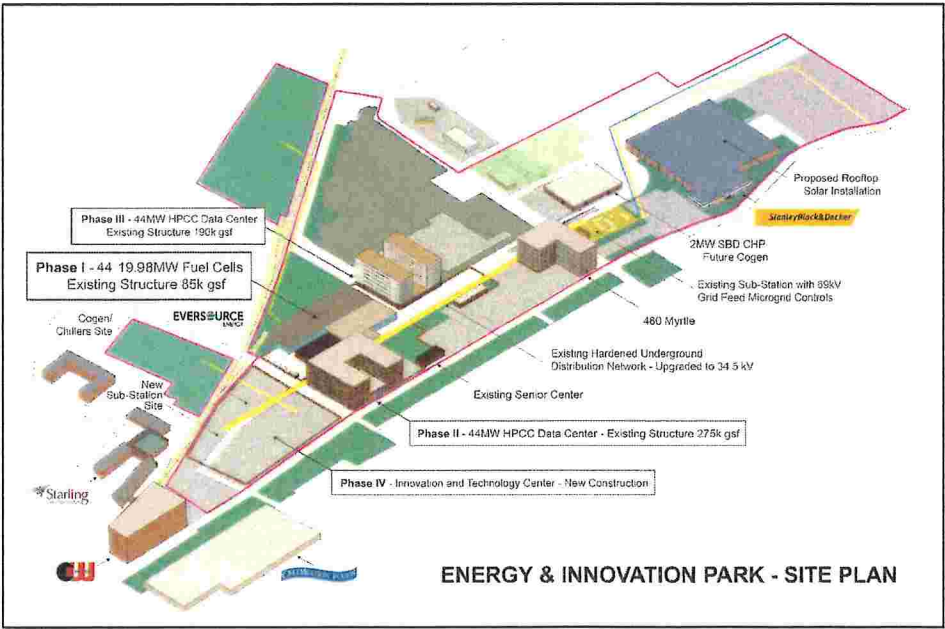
Energy & Innovation Park - Site Plan. The Project is Phase I specifically.
